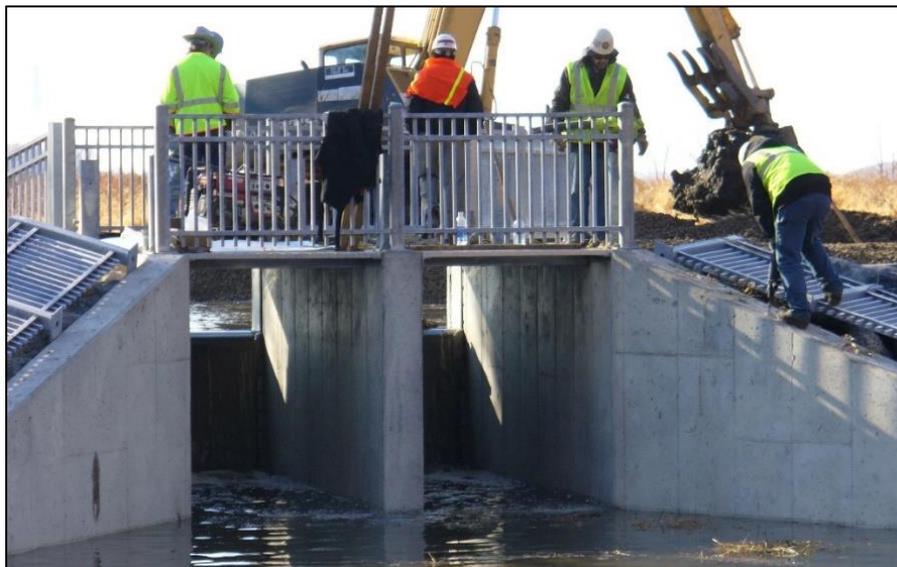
Long Meadow Lake Water Control Structure During Handrail Construction
